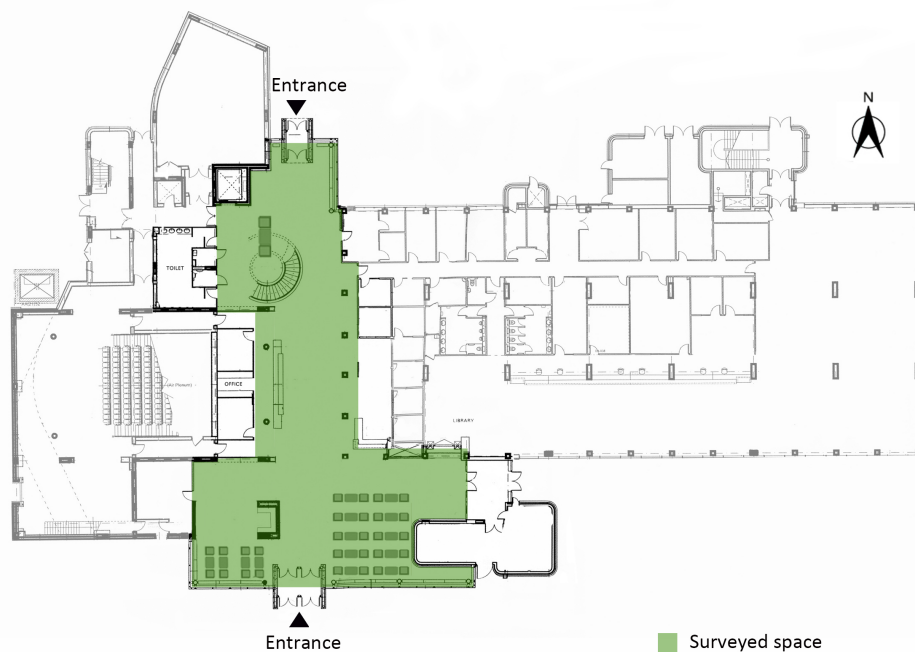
Floor plan of the case study building AGU's surveyed indoor transitional space.
